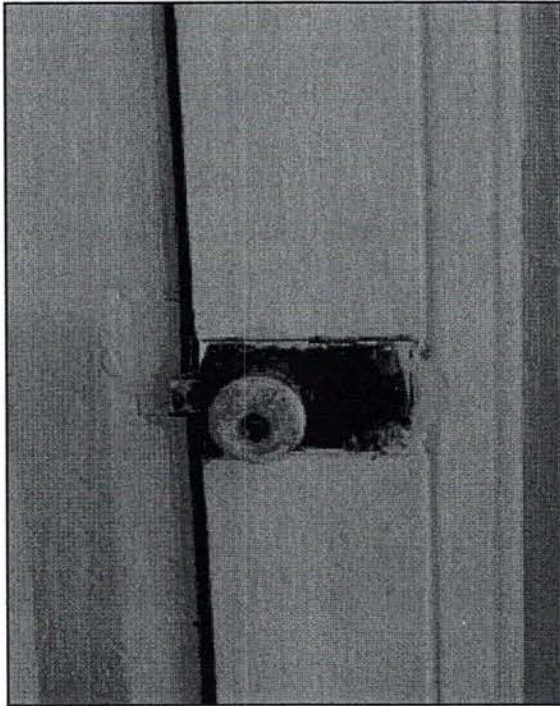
Cupboards are found next to the chimney flue in several of the rooms. The only remaining lock is found in Room 104.
